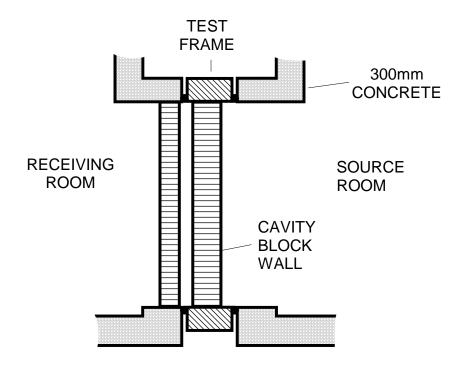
Cross section of the 2.4 x 3.05 m wall test opening at the National Research Council. The rooms are constructed of 300 mm concrete and supported on steel springs. Walls for testing are usually mounted on the wheeled test frame, which is not in solid contact with the structure of the source or receiving rooms. In this case, one wythe of the cavity block wall was mounted on the frame, the other was mounted in the receiving room opening.
